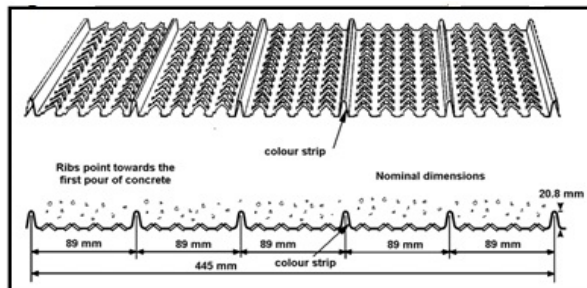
Illustration and cross section of all grades of Hy-Rib [12].
